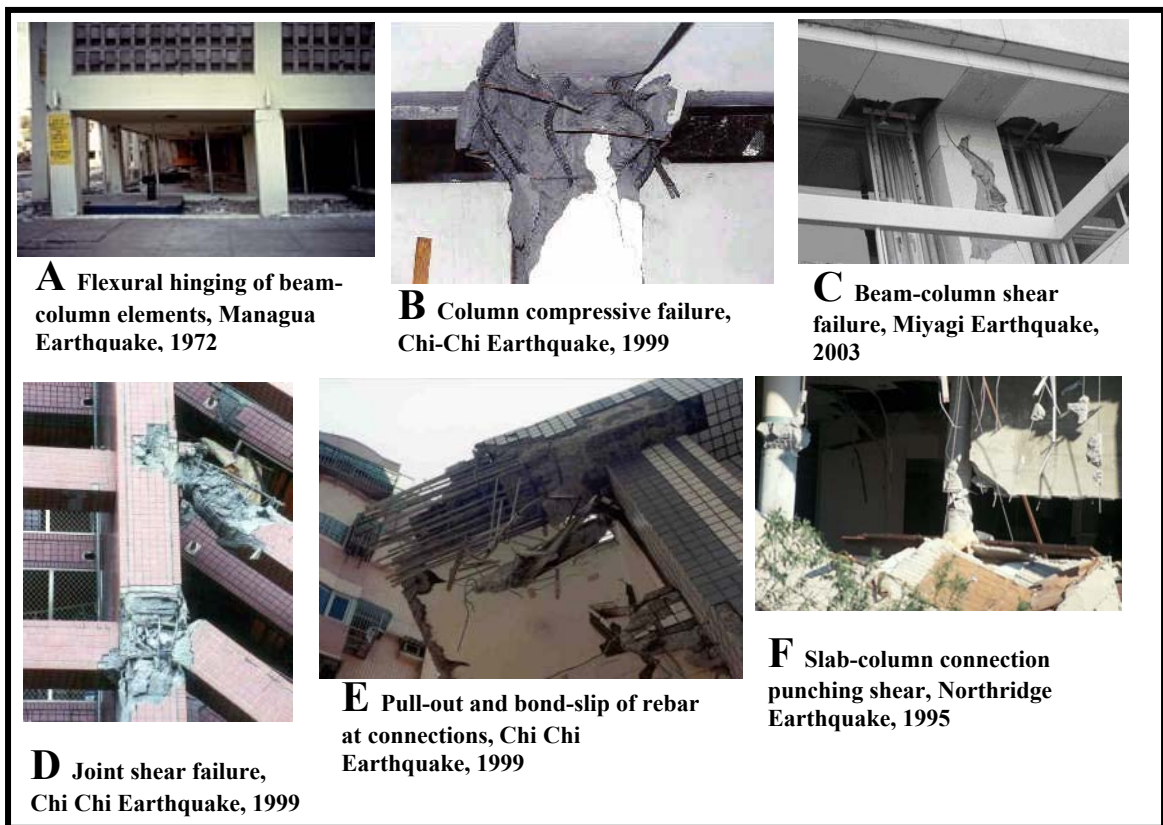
Illustration of possible deterioration modes for RC frame structures.<sup>6</sup>
